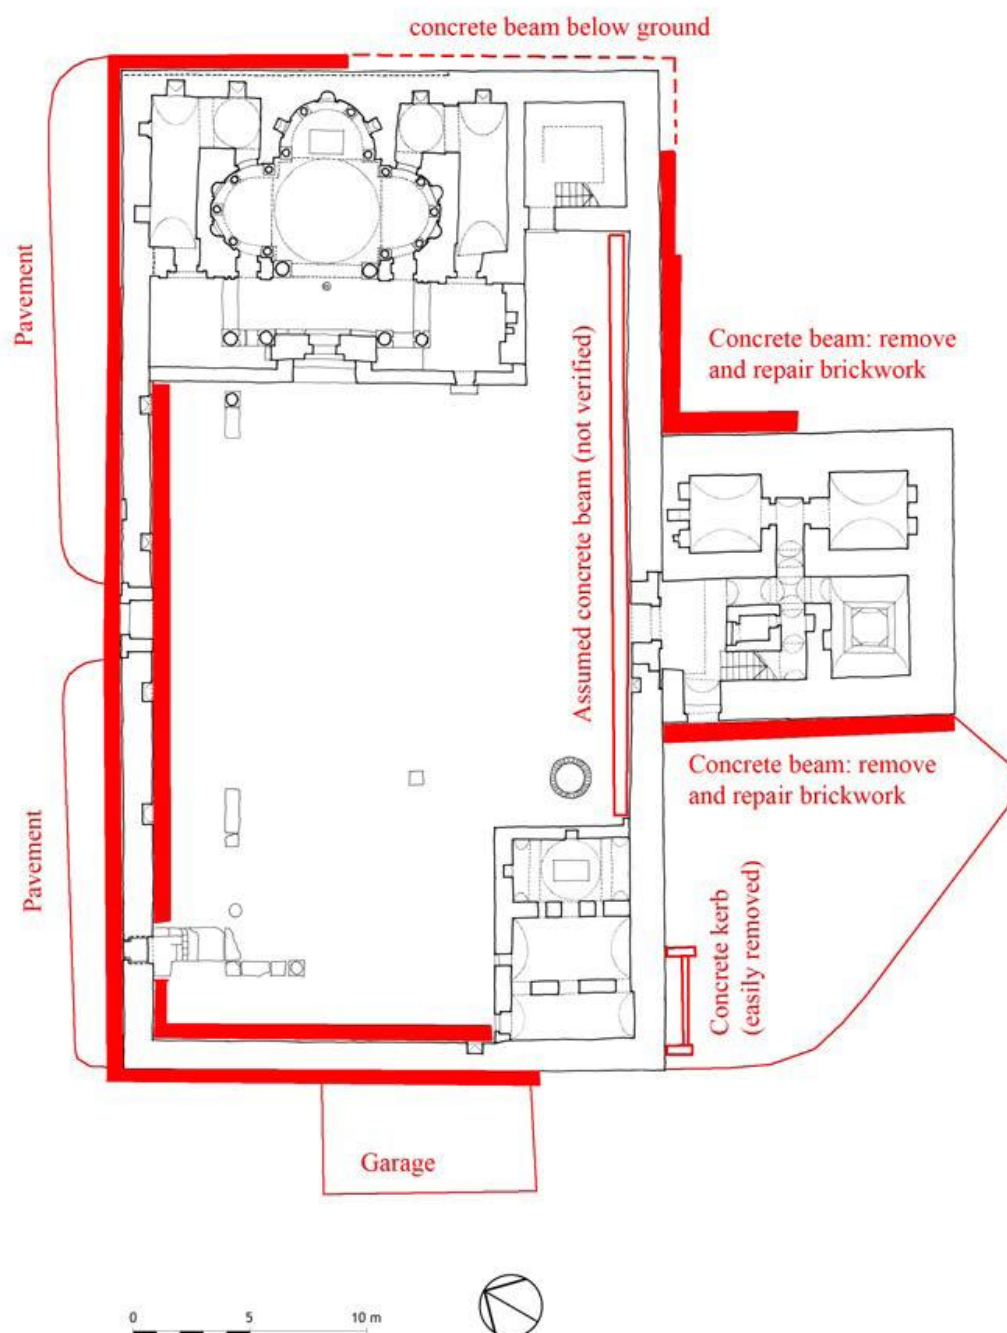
Plan showing location of concrete ring beam (drawing 2011: N. Warner)
